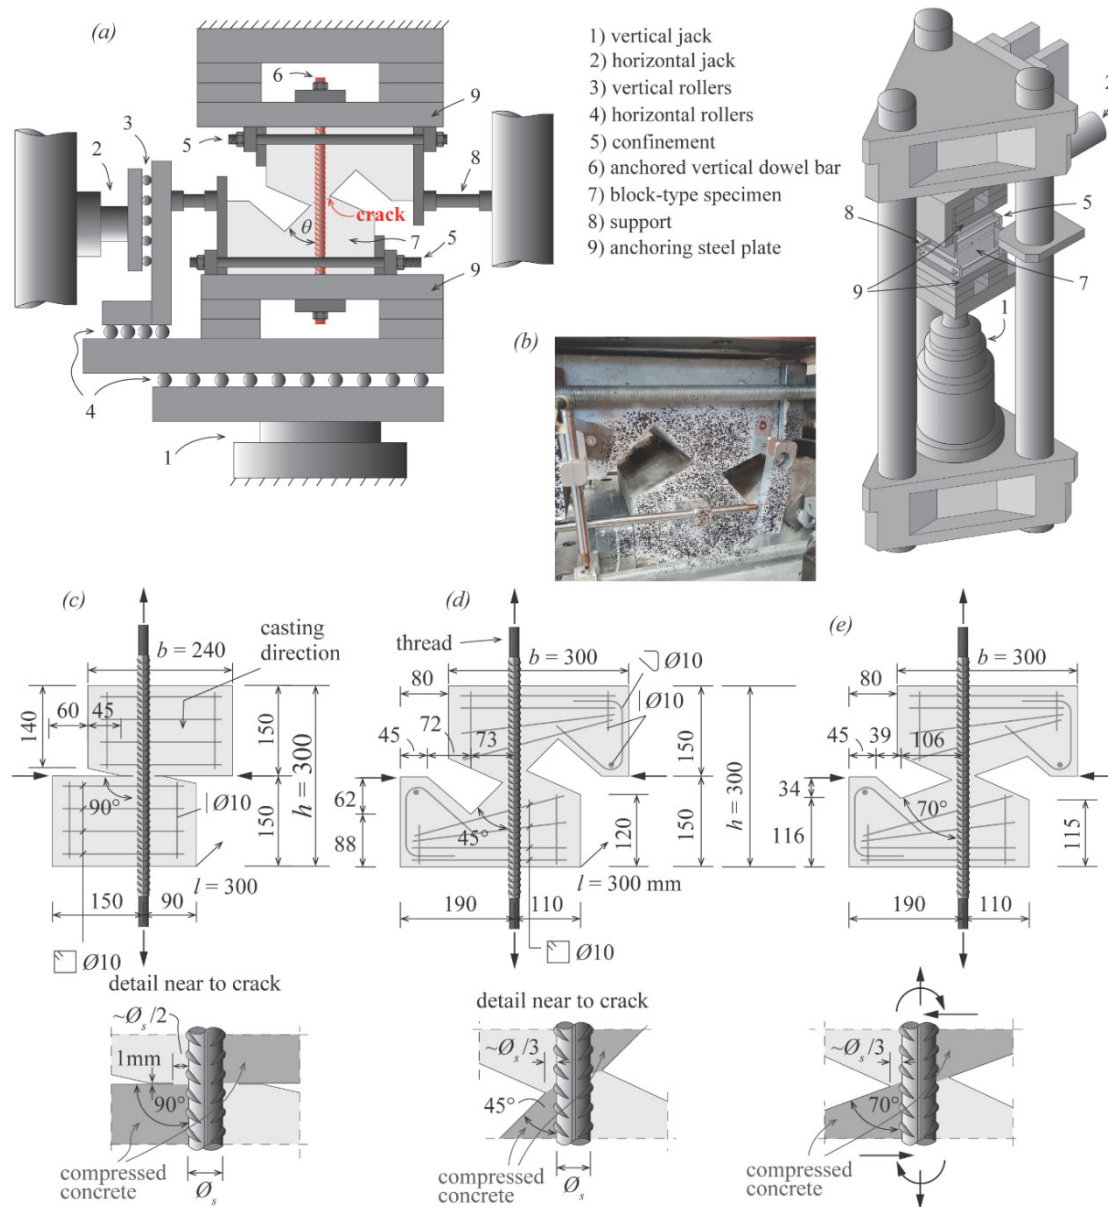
Test set-up and specimens for dowel DP tests: (a) test set-up; (b) photo of a specimen; and geometry of specimens, reinforcement and applied forces for (c) 90° ; (d) 45° and (e) 70° specimens (dimensions in mm).
